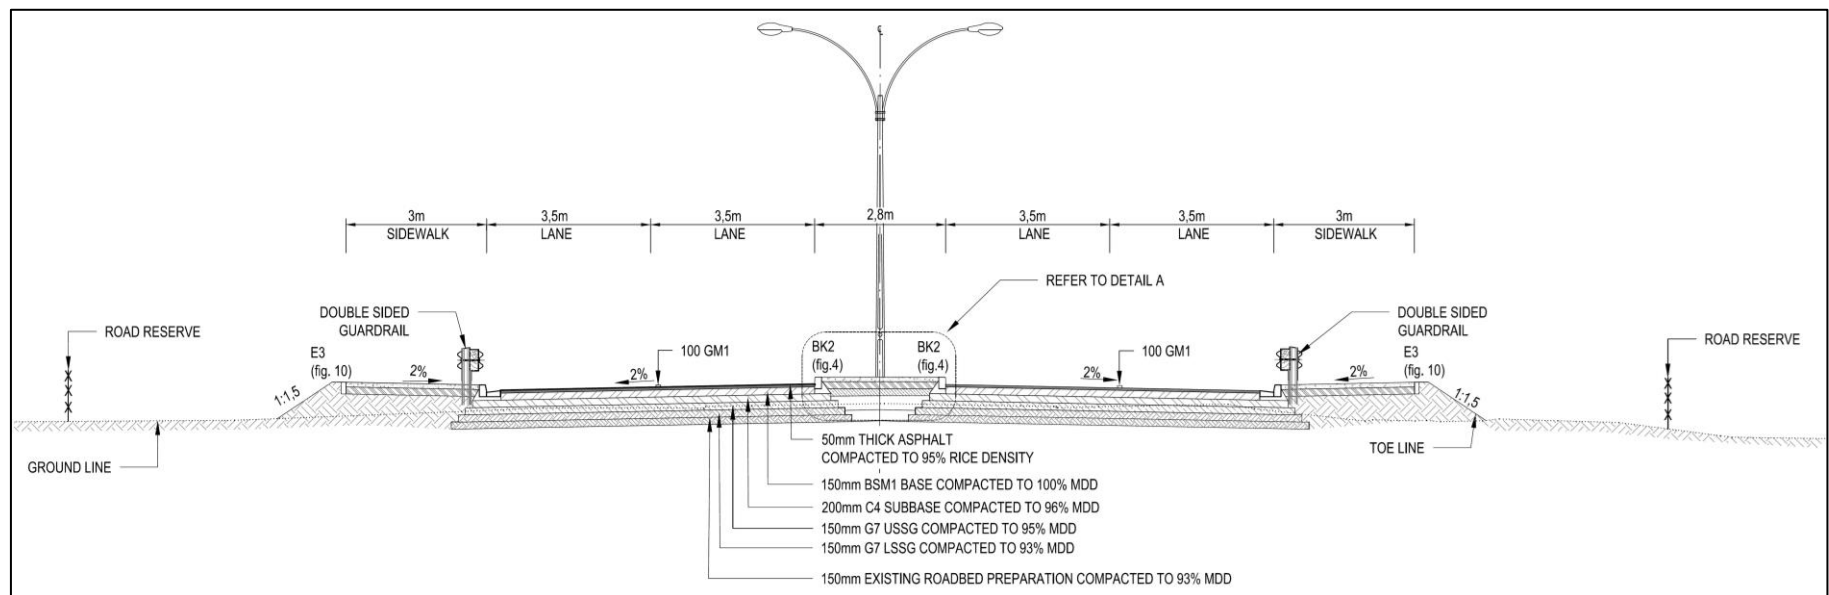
Typical Cross-section from km 26.05 to km 26.13
